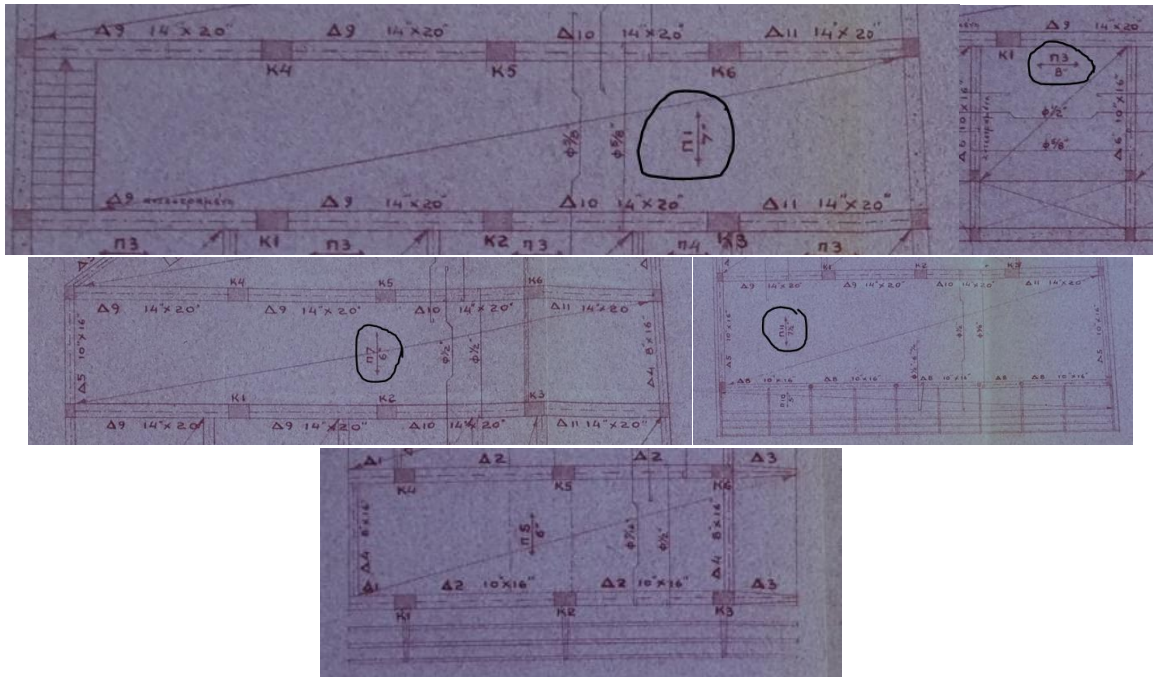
Slab depth based on original drawings: (a) over 2nd basement, (b) under ground floor, (c) above ground, (d) typical floor
